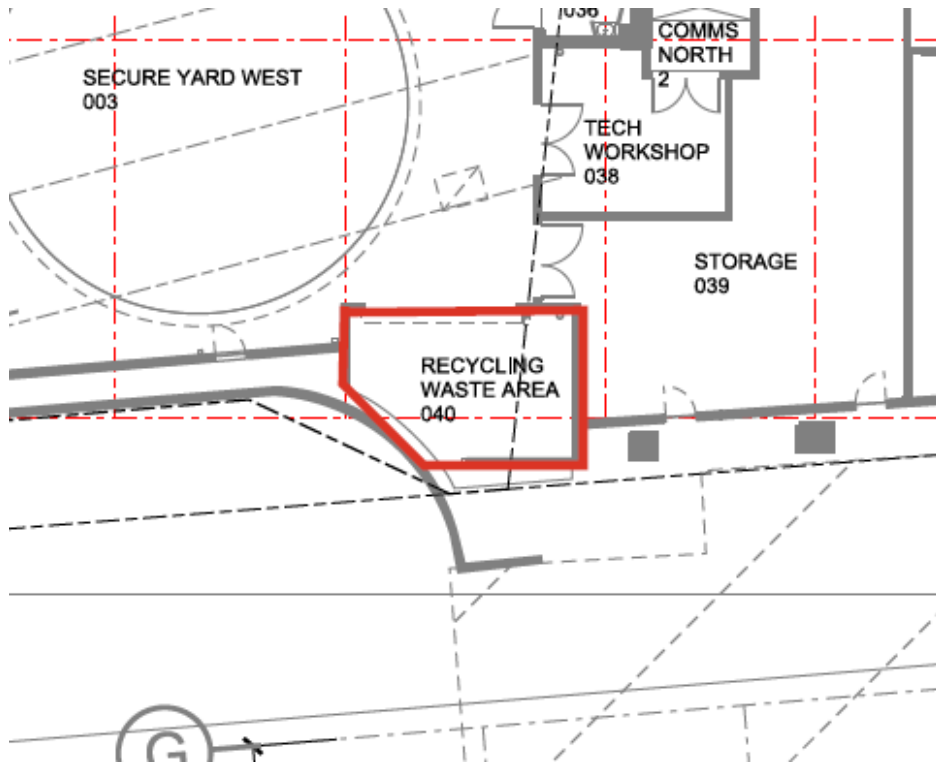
Waste storage area location on ground floor SYDE – Drawing ar-1201
